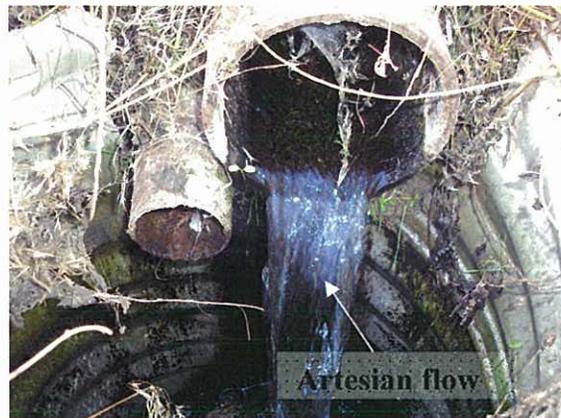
Photo taken facing west looking at flow from discharge pipe.
